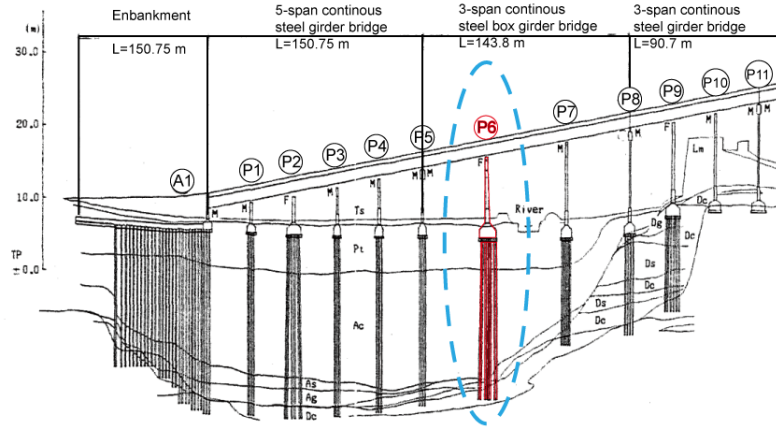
Plan view of Ohba-Ohashi bridge (modified after Ohira et al. [18])
